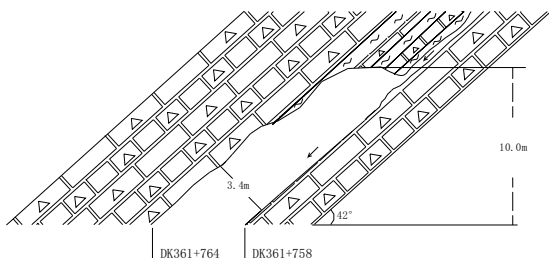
Karst development on the right wall of Yuanliangshan tunnel
